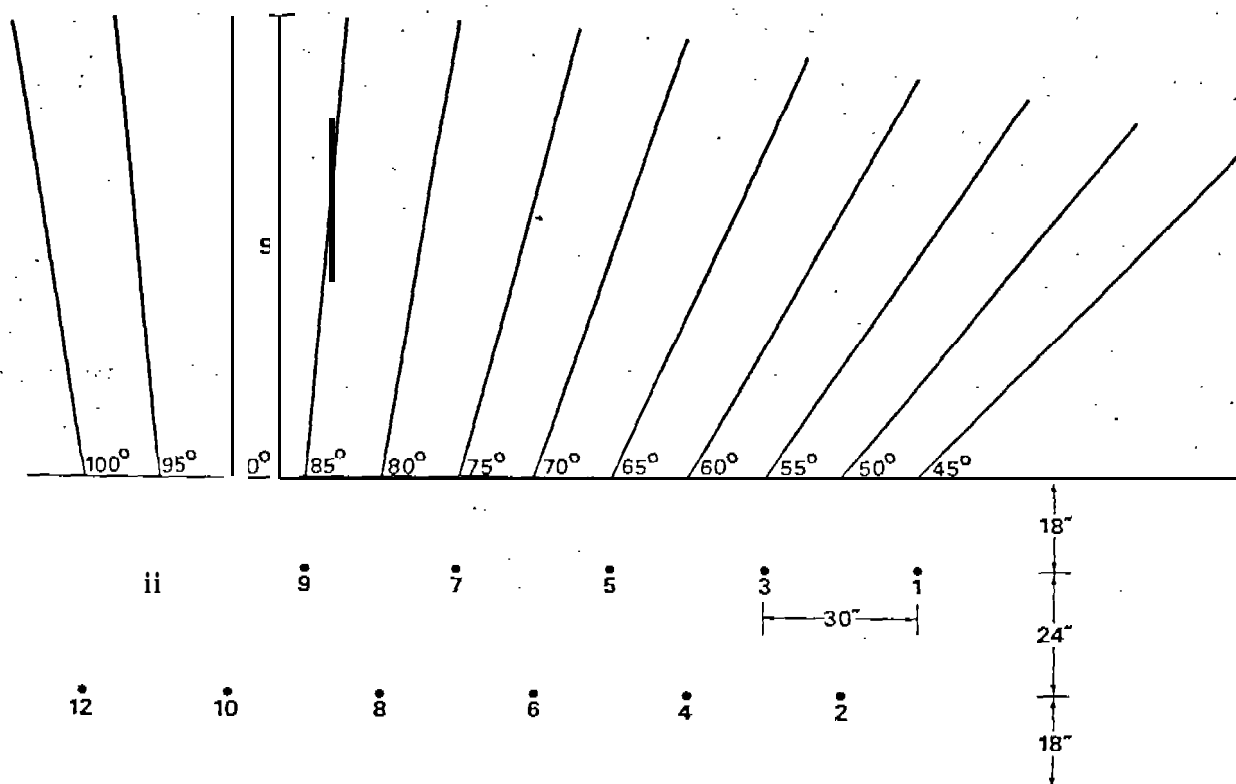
Layout of the 12-hole, slab-round, shot pattern.
